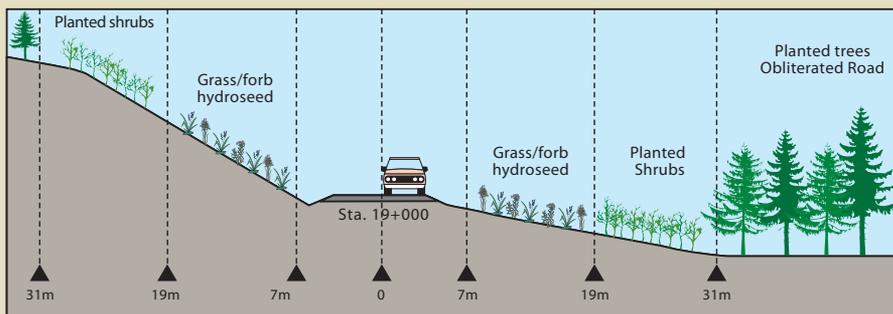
B – Cross-section showing revegetation zones as interpreted from engineering plans.
